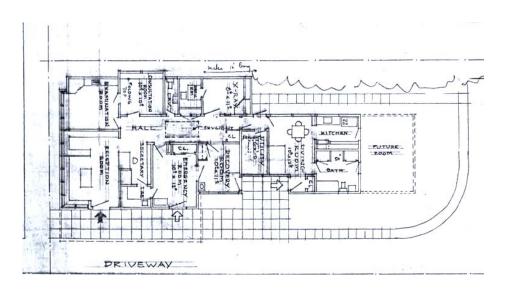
Original floor plan for the Office of Dr. Grau, 1941.
